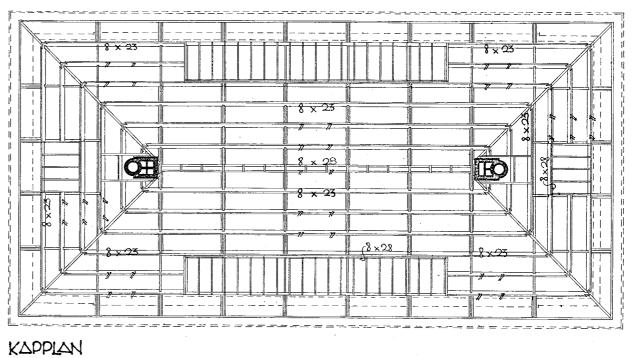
Floorplans 1:200, including construction (Gemeentewerken Rotterdam, n.d.)
